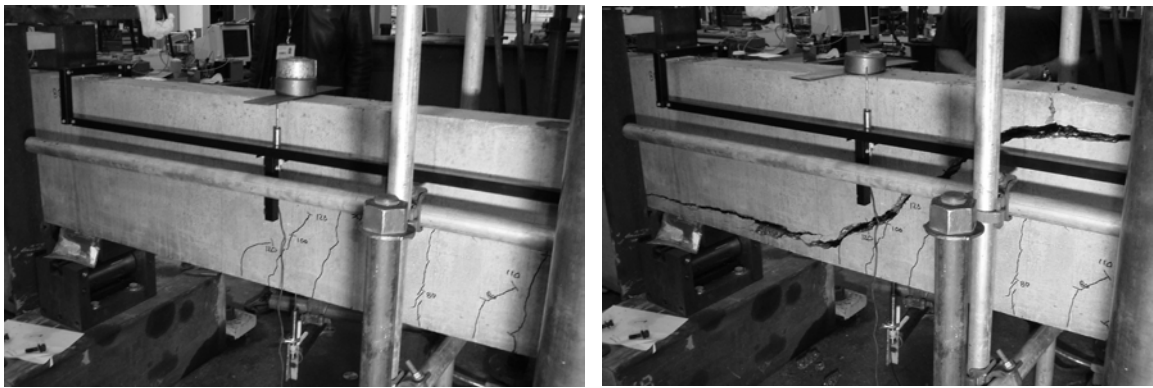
Diagonal tension failure along main shear crack (Beam BL01)
